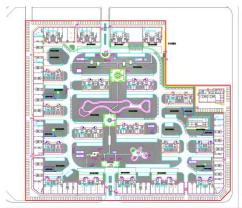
Layout Plan and Current Status of Resettlement Houses in Xincheng Garden
